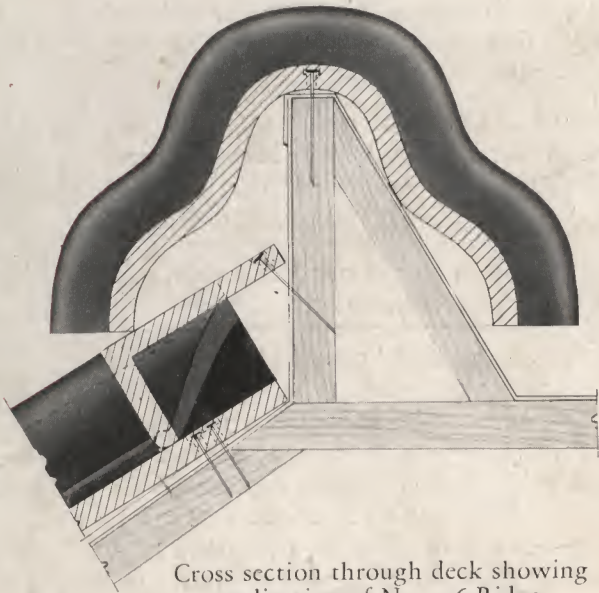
DETAILS OF "IMPERIAL" SPANISH TILE AND FITTINGS
